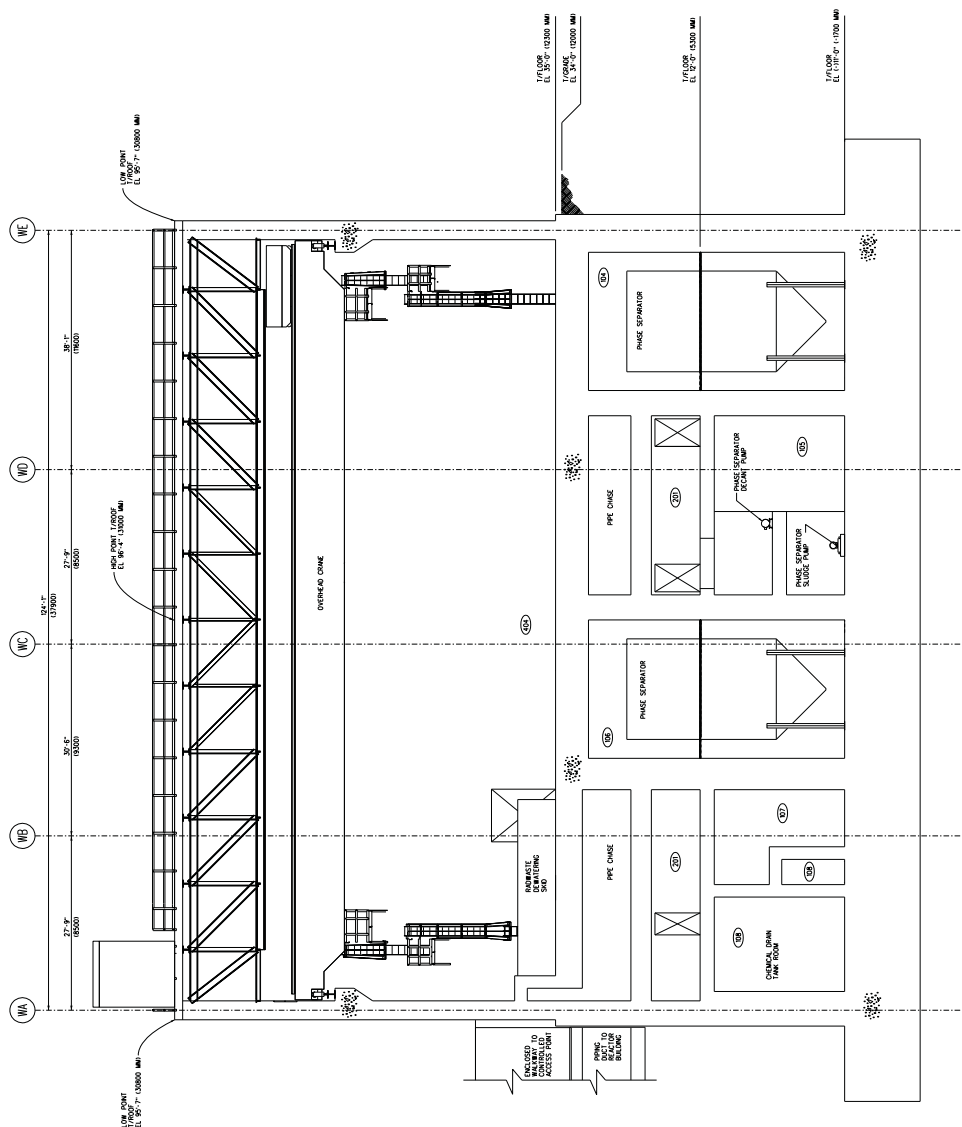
E RADWASTE BUILDING, SECTIONS A-A, B-B (SHEET 2)
